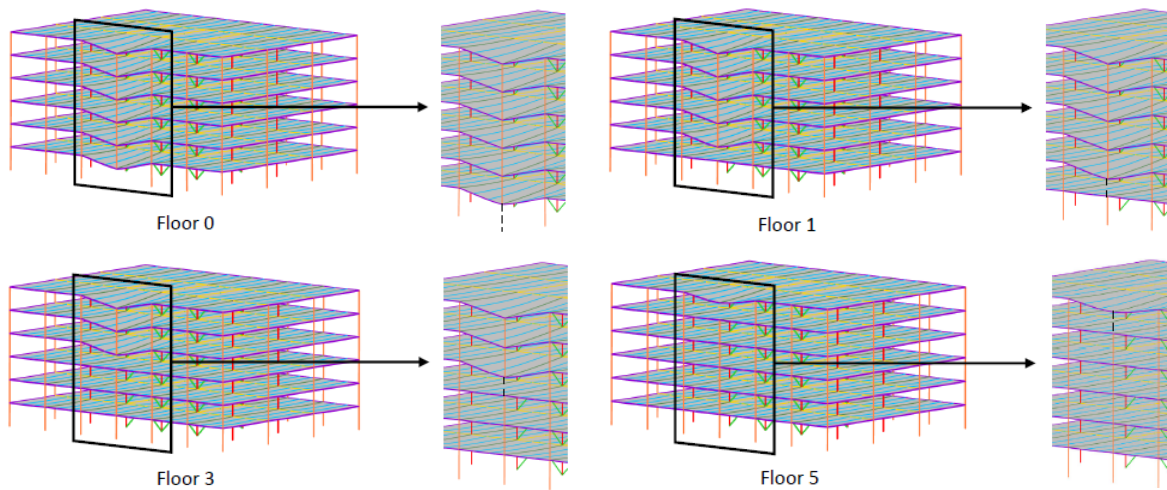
Global view of the structure - Losing corner column C2 (Pinned connection).
